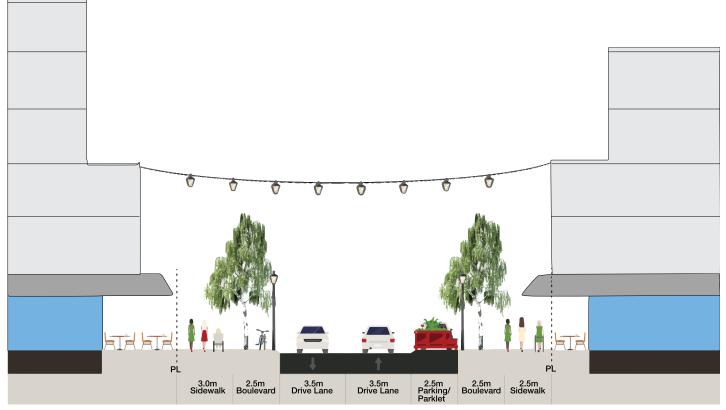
Conceptual cross section for Oak Street (20 metres)
